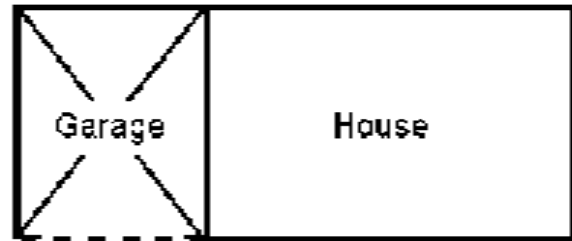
If the wall of the main house is in line with the wall containing the door of a garage with a room over it, the adjoining wall may help brace the garage.
